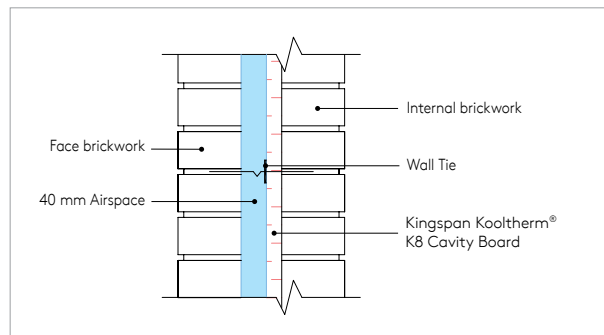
Side elevation – Double brick cavity wall with Kingspan Kooltherm® K8 Cavity Board.
